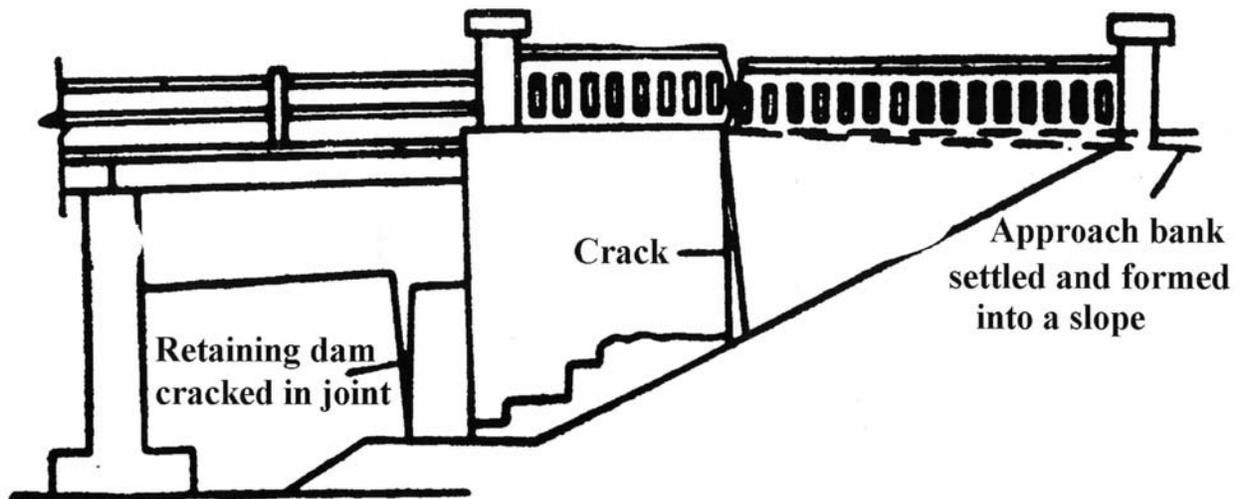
A sketch of the damage to the bridge abutment and retaining dam at the Peizhuang ship lock.
